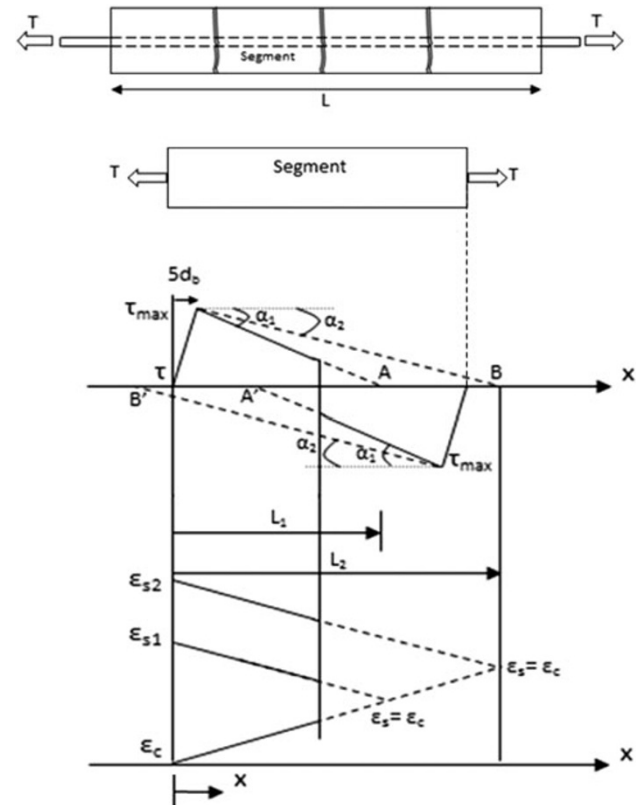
Bond stress and resulting steel and concrete strain distribution between adjacent cracks in a reinforced concrete member.
